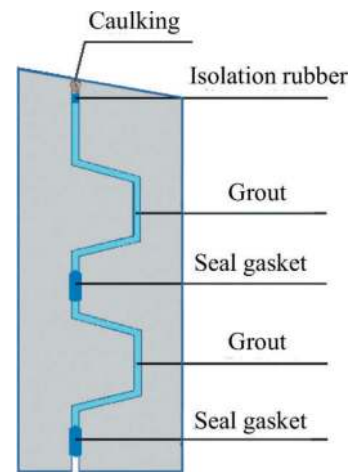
Joint waterproof of grouted mortise-tenon joint.
